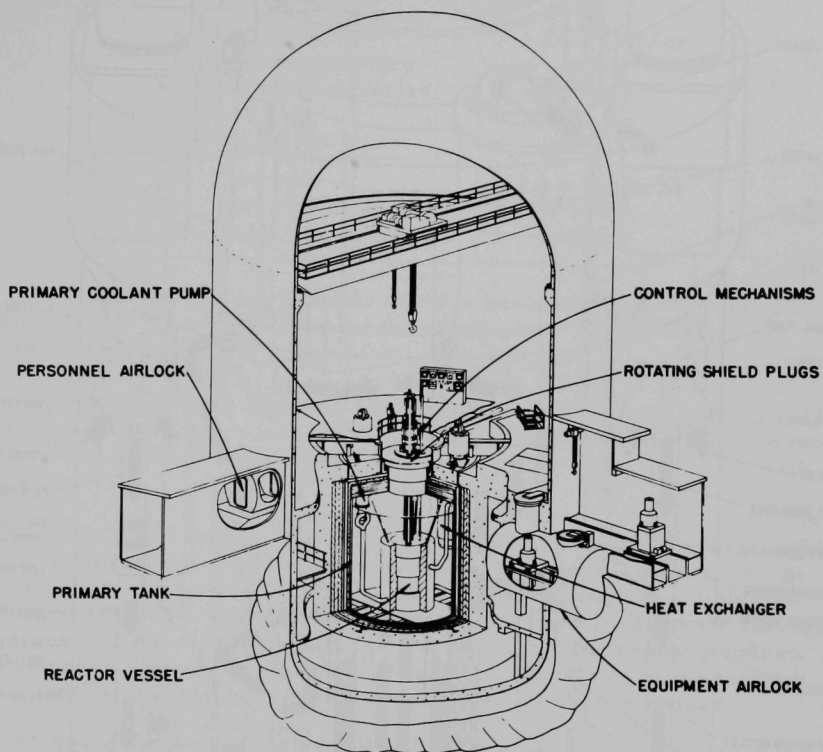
Cutaway View of Reactor Building. ANL Neg. No. 103-P5437.
